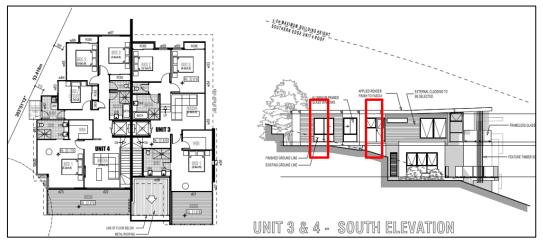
Setback of Unit 4 from southern boundary - upper floor
